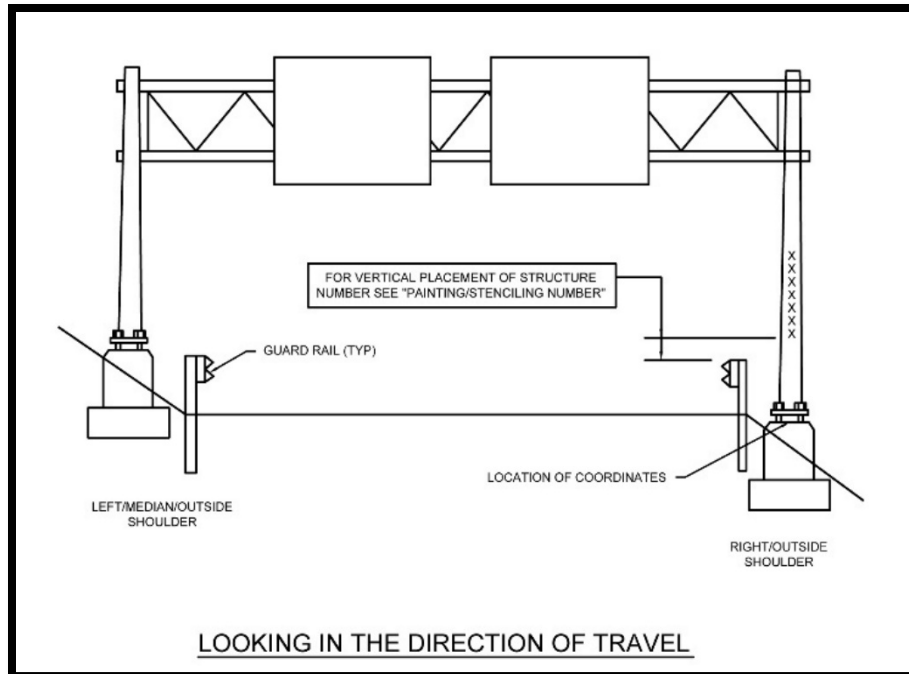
STENCILING FOR FULLSPAN STRUCTURES
